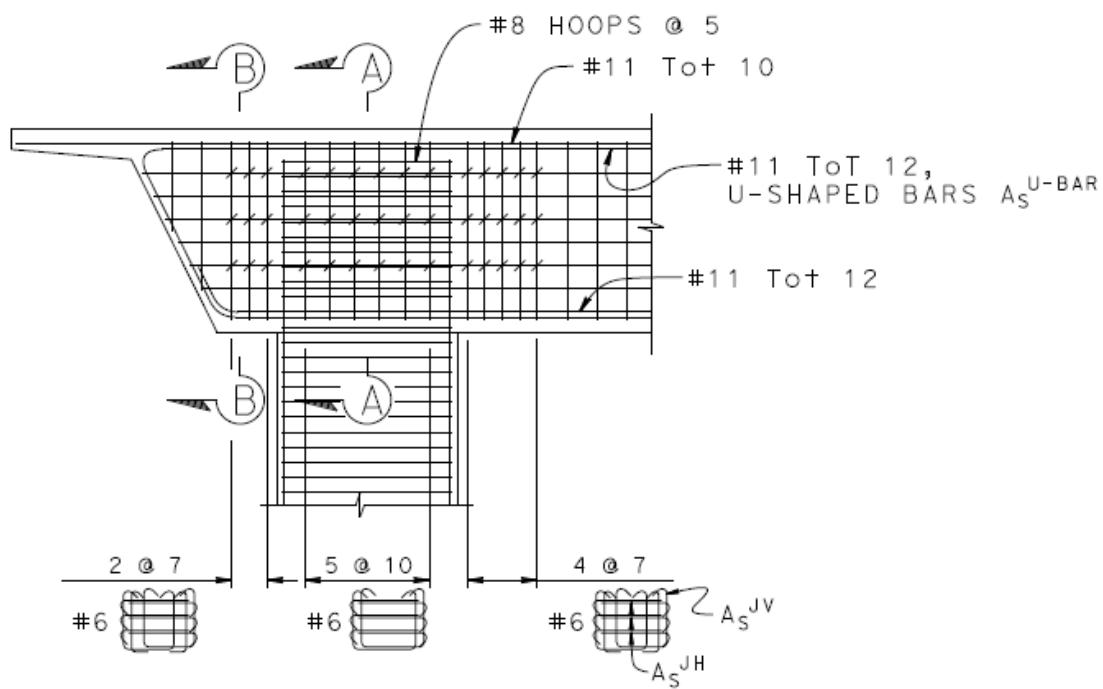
Location of Joint Shear Reinforcement (Elevation View)
